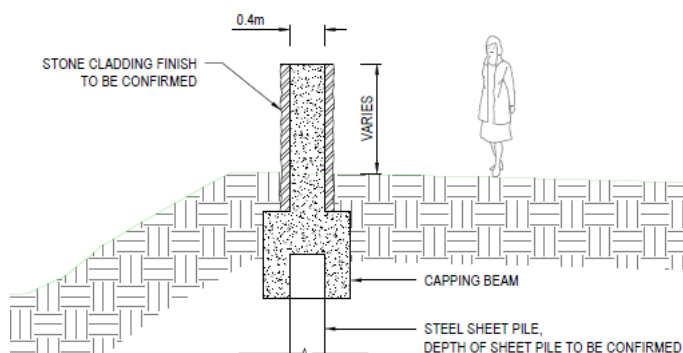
Sketch Steel Sheet Pile (SSP) 'I' Shaped Flood Wall
